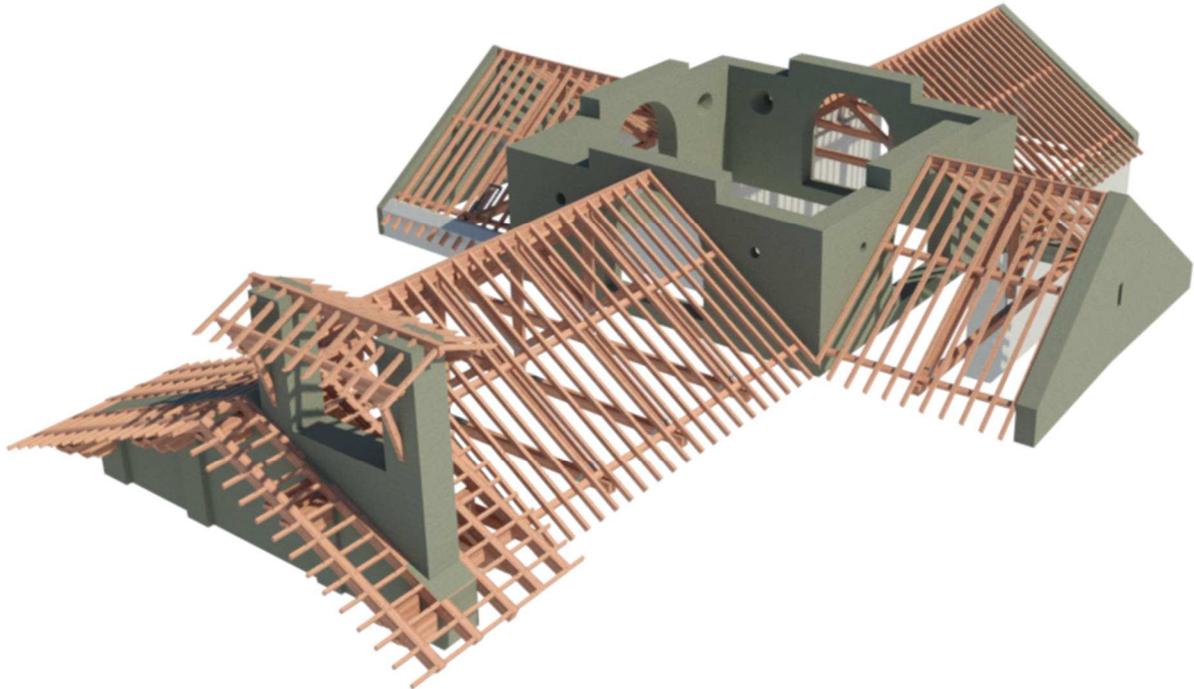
Wooden Frames Arrangement of the Roof in Revit
